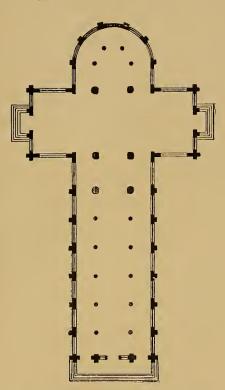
GROUND PLAN FOR A CATHEDRAL.
